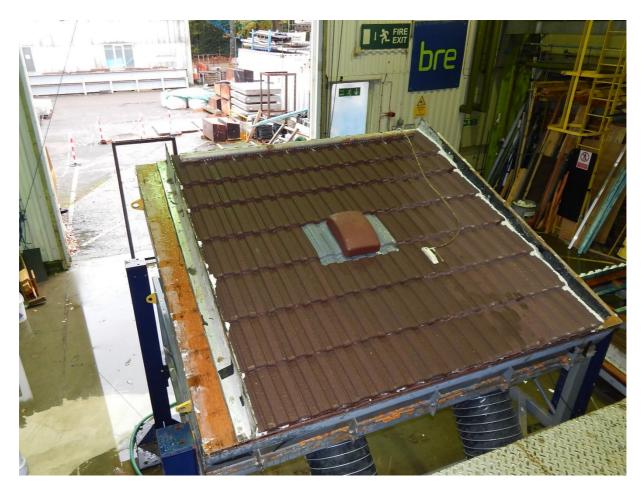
View of the Manthorpe Cowled Universal Roof Vent with a Small Format Castellated Tile installed on the BRE test rig
